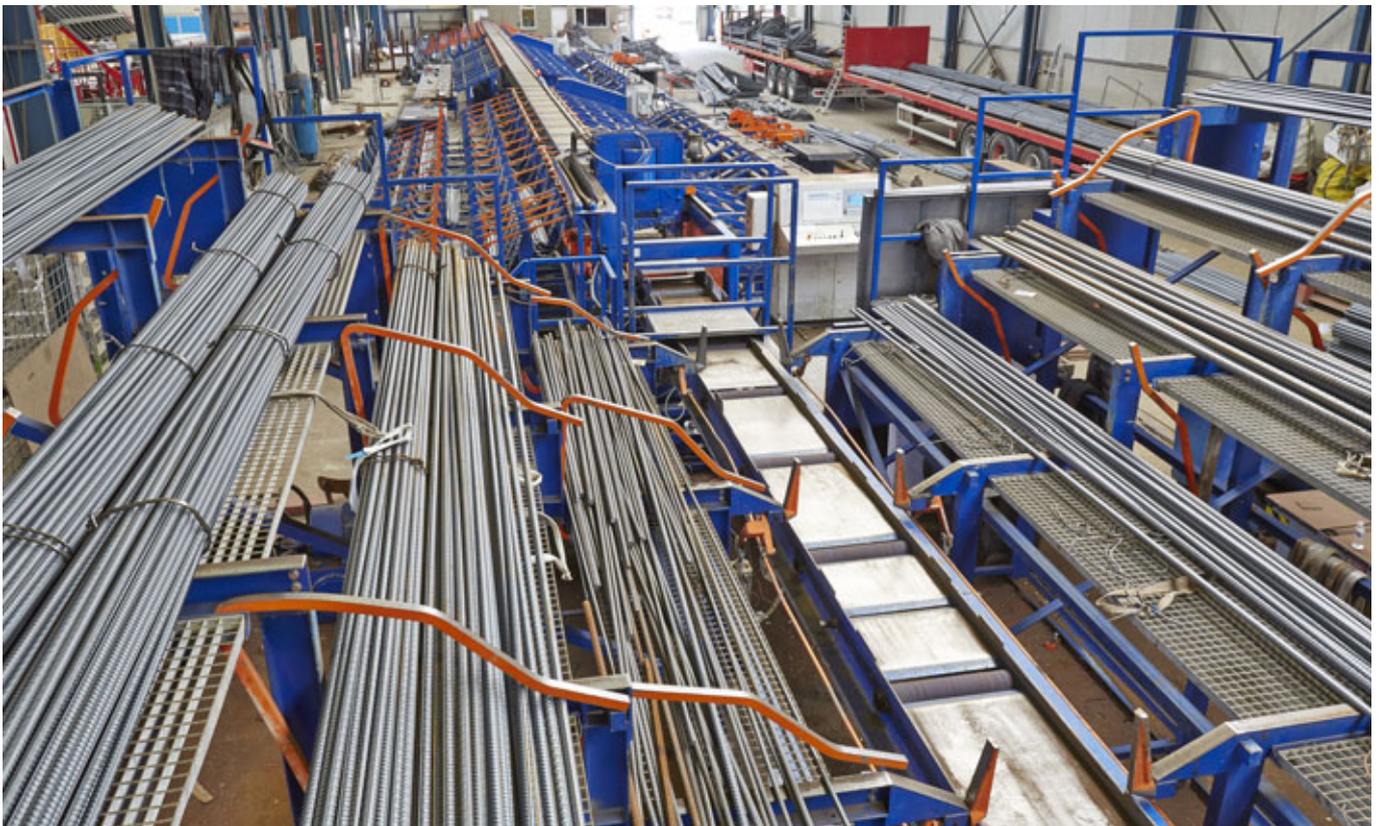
Stationary Cadomatic 500 bar cutting machine as a volume cutting system with integrated automatic bending machines.
